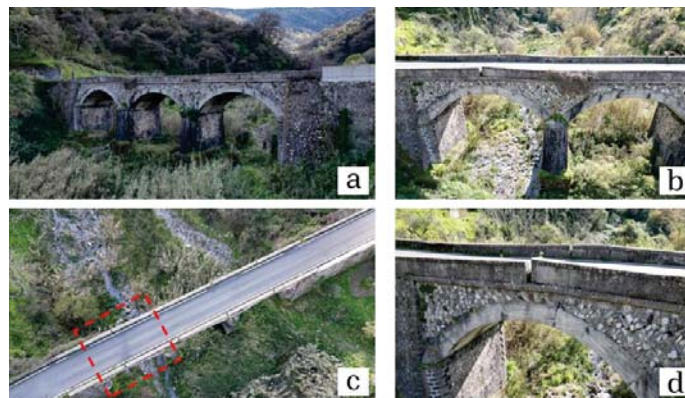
Signs of stress observed on the structure of the first case study: a) overview of the bridge; b) overview of the nutcracker mechanism; c) aerial photo of the bridge highlighting the dark color of the road surface at the misalignment; d) detail of the misalignment and crack caused by the nutcracker mechanism.
